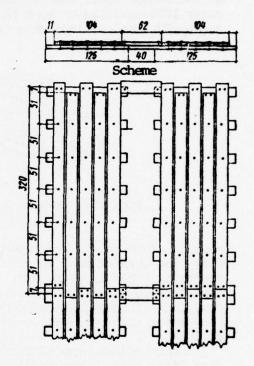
Prebab track surface of the World War II period made of plank panels.
